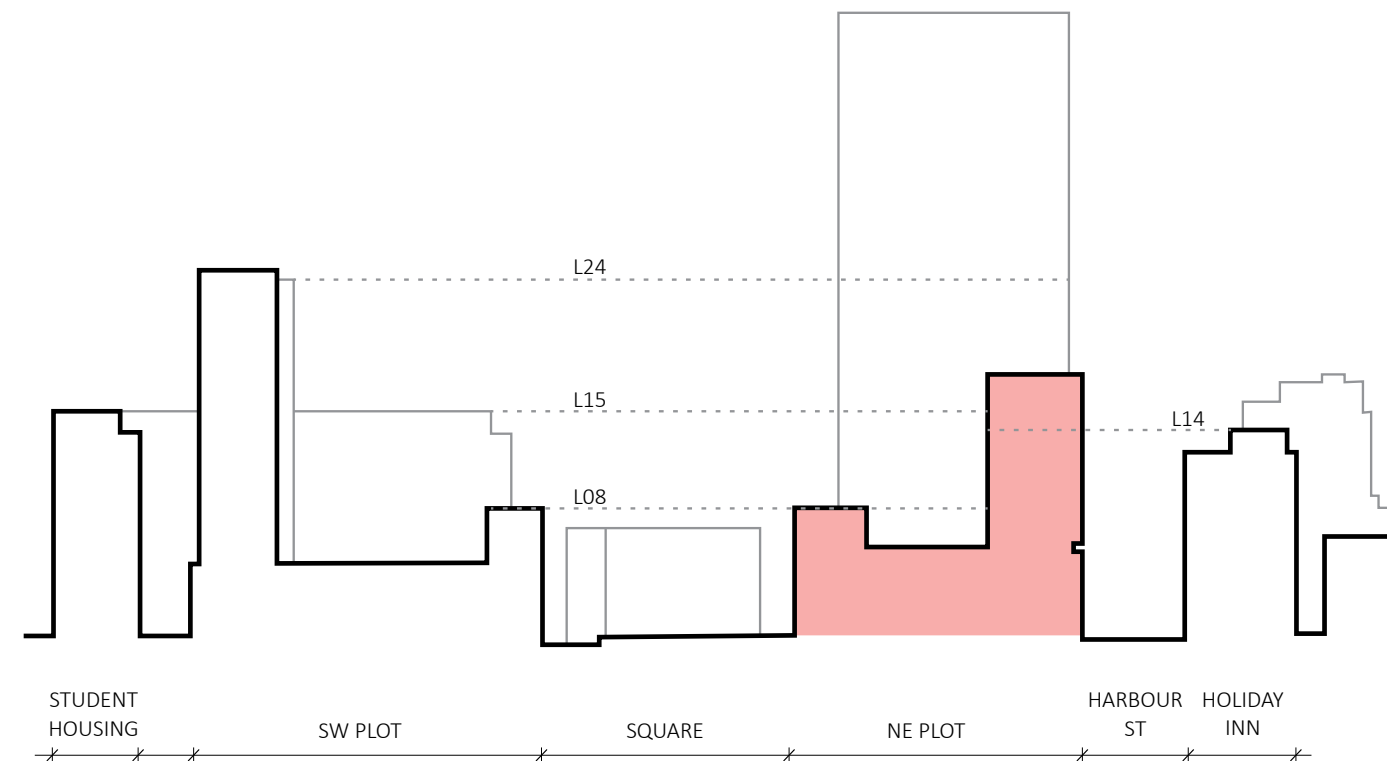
Section - East West study of site context and opportunities for building design and views
